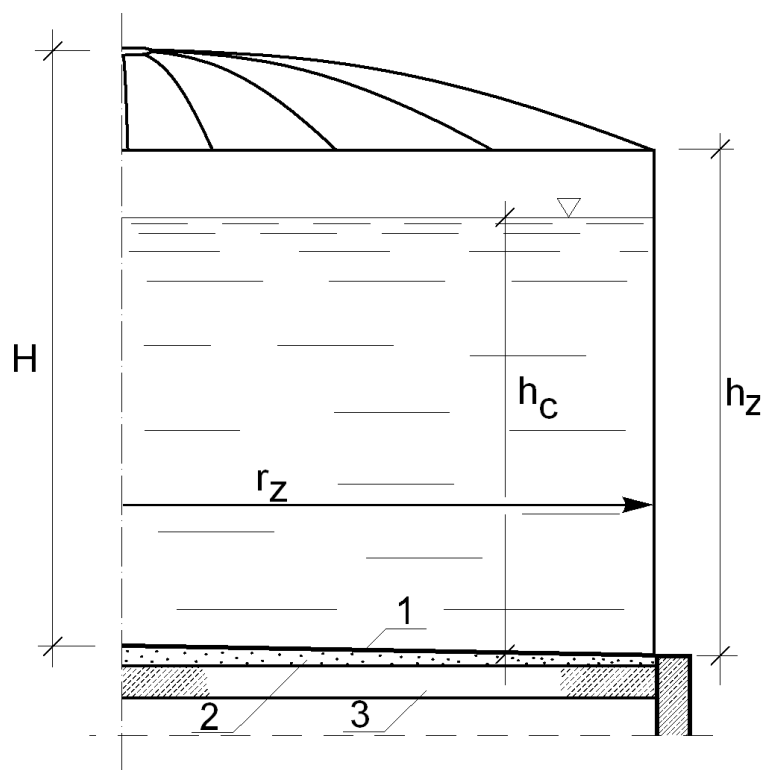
Foundation of cylindrical tanks; 1 - bottom of tank; 2 - insulation layer - sand, sand-bitumen or bitumen pad; 3 - native soil/reinforced concrete slab
